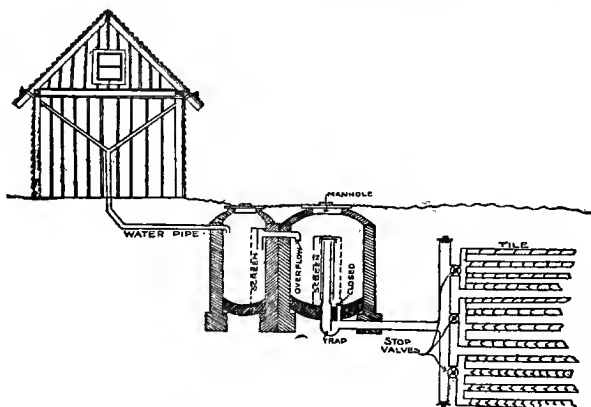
Sewage disposal plant, septic tank, and irrigation plant.
